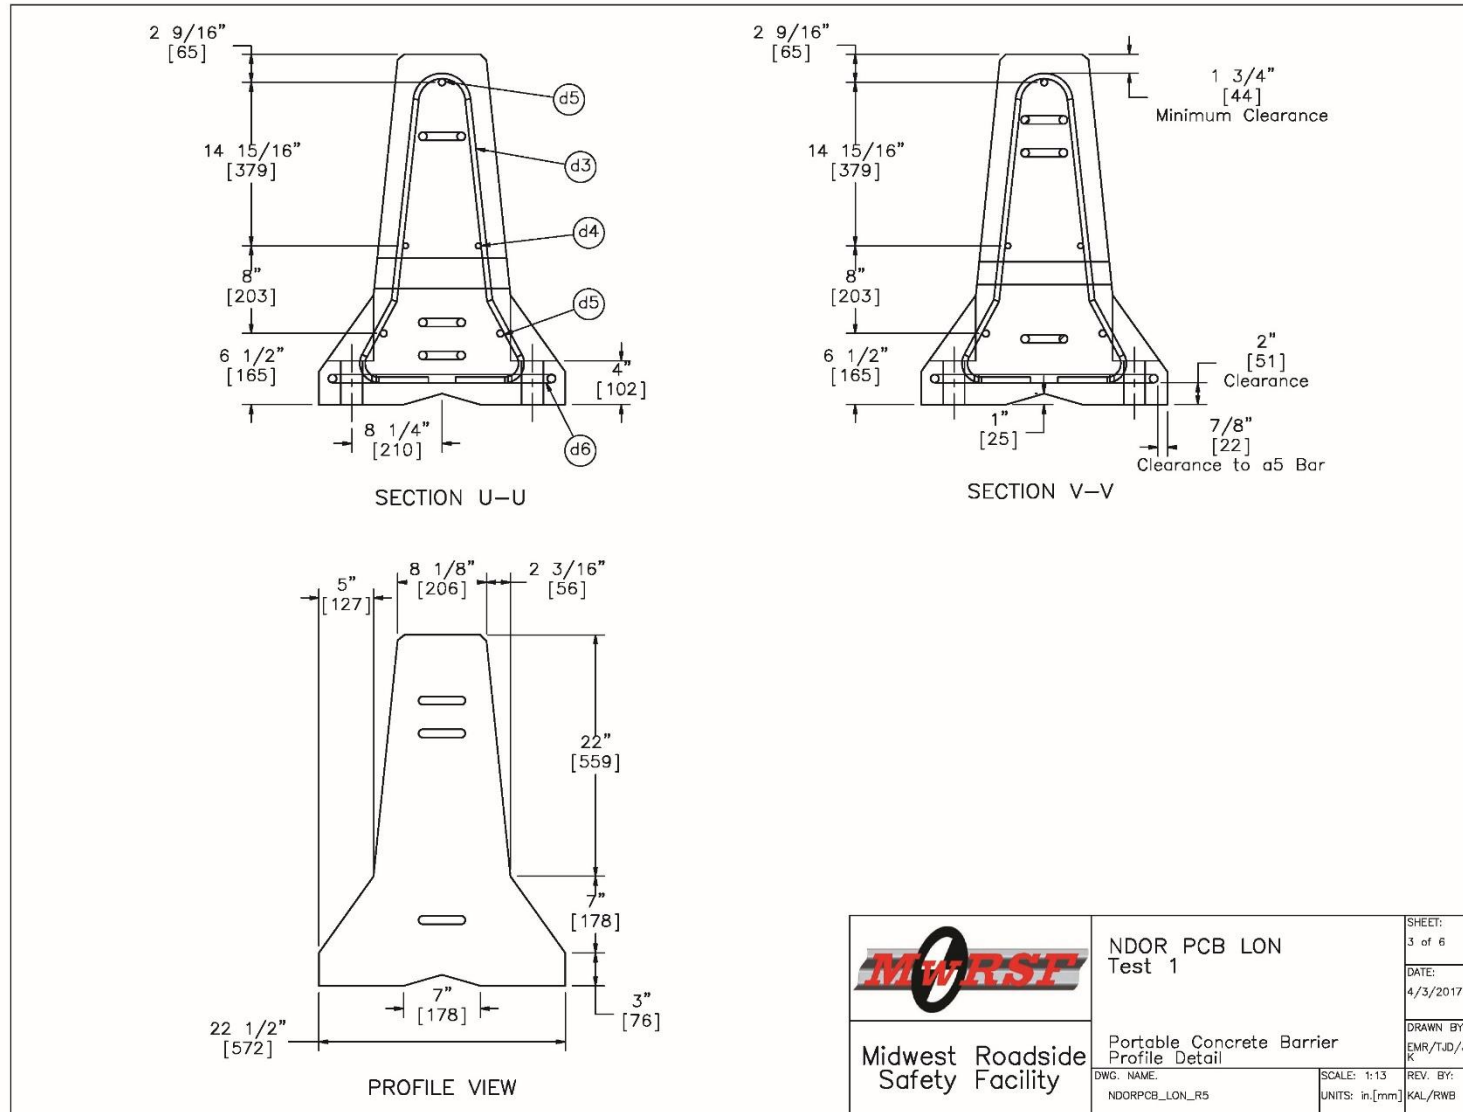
Portable Concrete Barrier Profile Detail, Test Nos. NELON-1 and NELON-2
